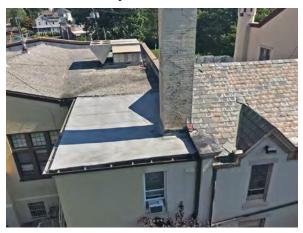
View from the east side of the building of slate roofs on Borough Hall, the sheet membrane roof on the rear addition, and membrane roof with ballast on the Library. Also note the step cracking on the square boiler chimney.
